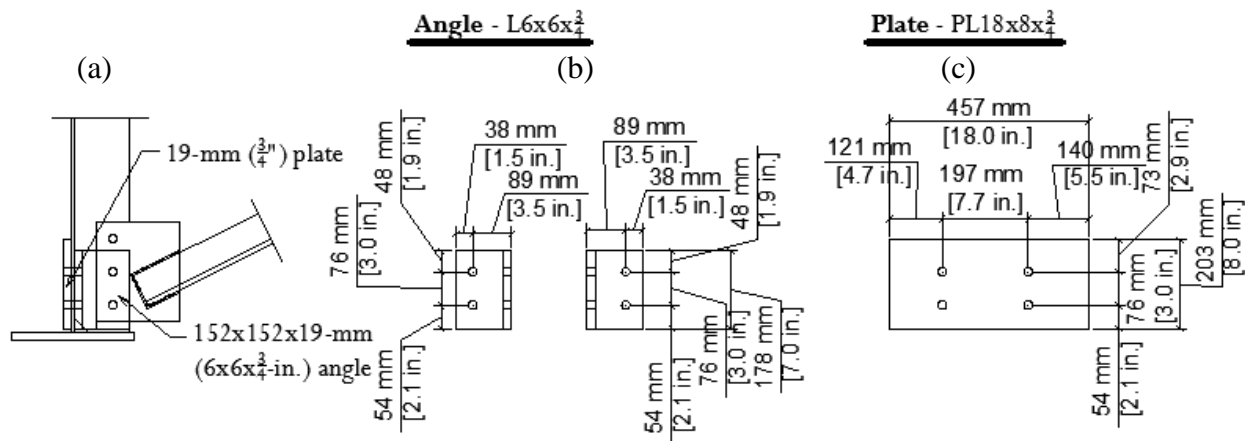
Dimensions of angles and plate evaluated experimentally. a) side view, b) angle dimensions, c) plate dimension
